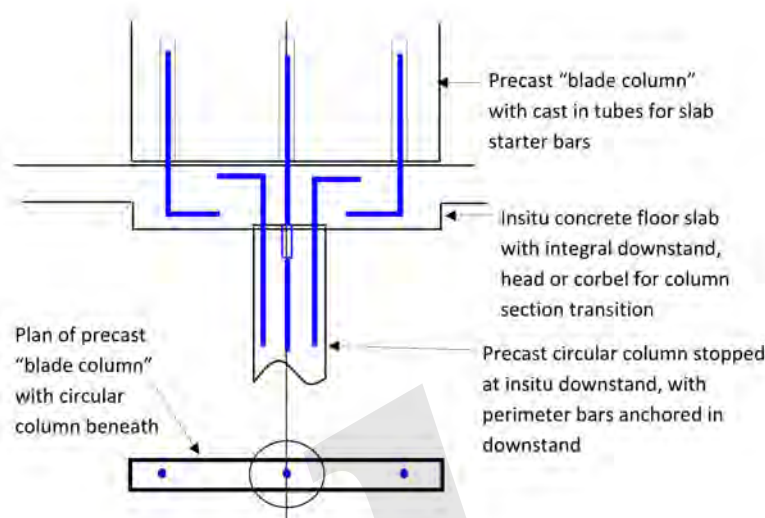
Example of circular section below, changing to "blade column" above.
